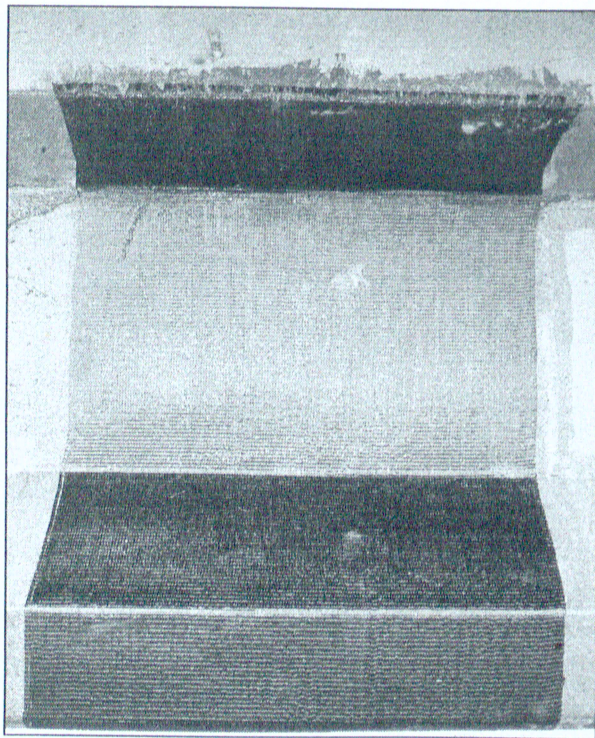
First and second CFRP U-wrap layers with longitudinal anchor strips
